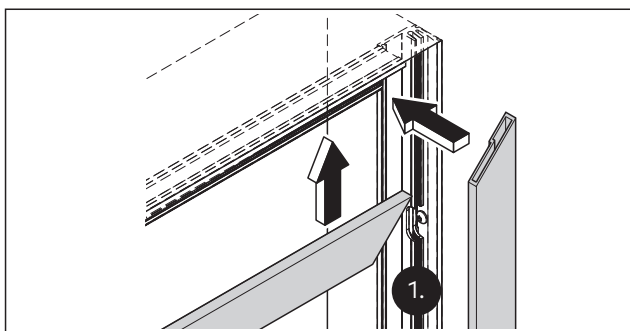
Example of the fixed glazing adapter mounting on corner joint with miter
